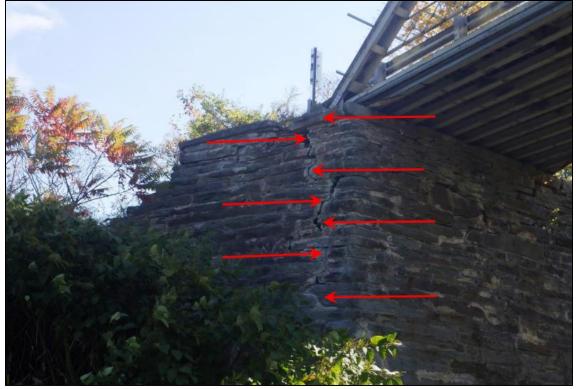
Looking Upstream at Existing Truss Bridge (September 2023).
